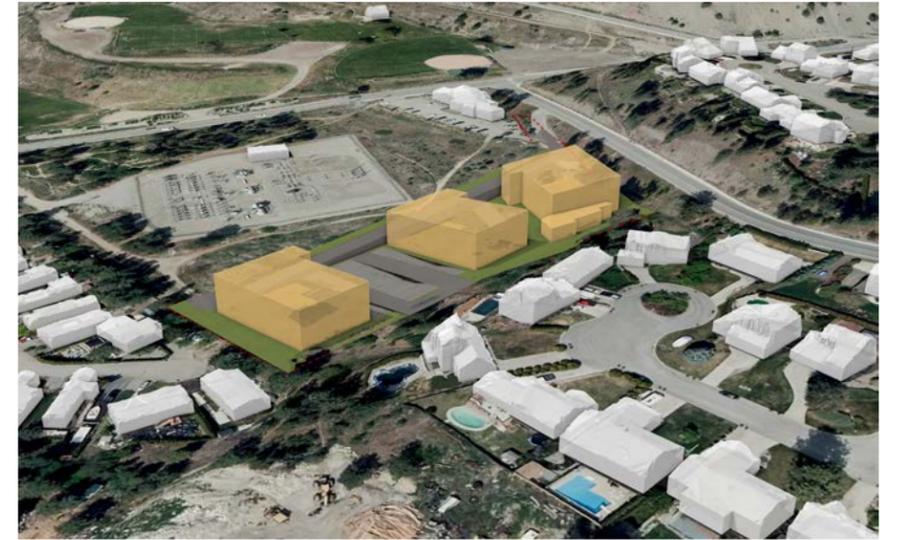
Massing Rendering - Looking Northwest from southeast of the site
